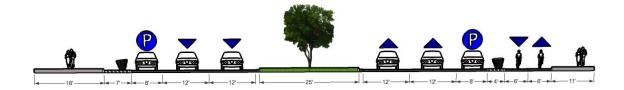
A: Old Colony Avenue Selected Design Cross Section Looking South Wide Section
